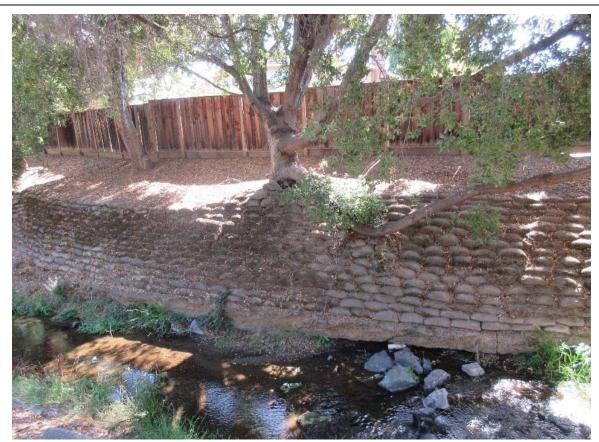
Sacked concrete stabilization of south side of the creek, south of Rodrigues Avenue.
